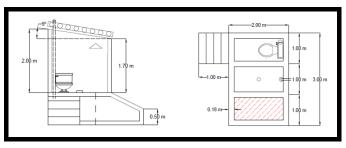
Plan and profile view of the constructed "pipe-in-bottle" solar shower/latrine
